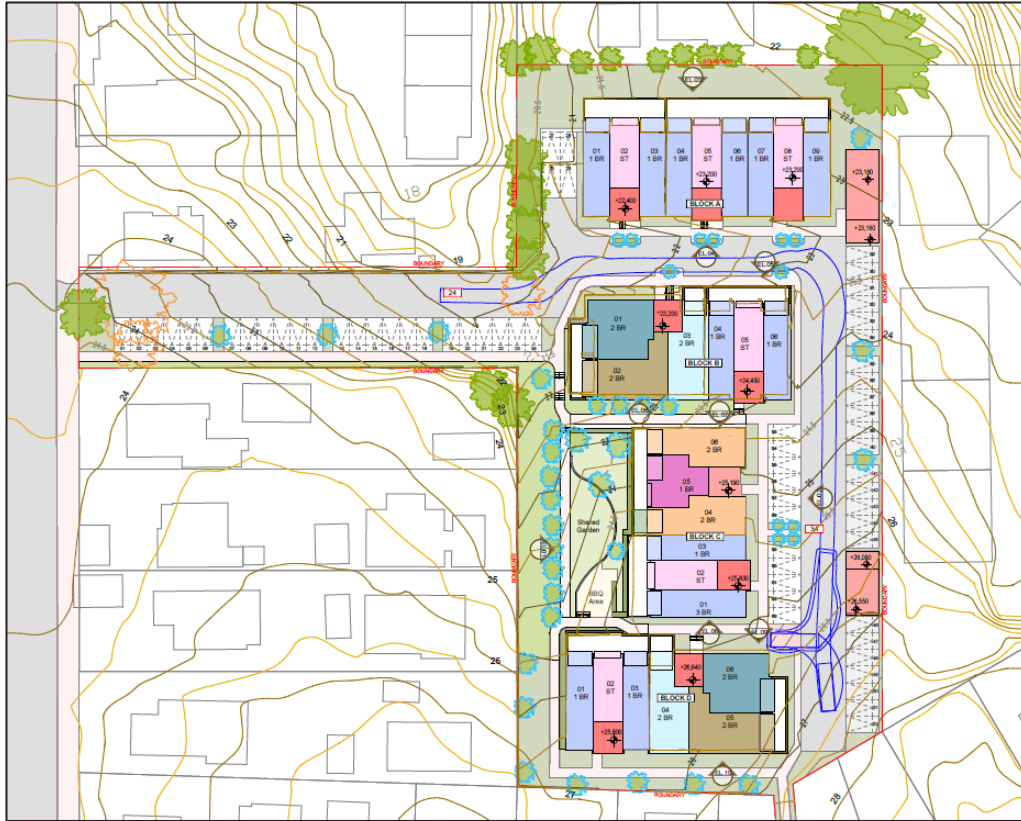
Proposed site plan for development (Brewer Davidson Architects).
